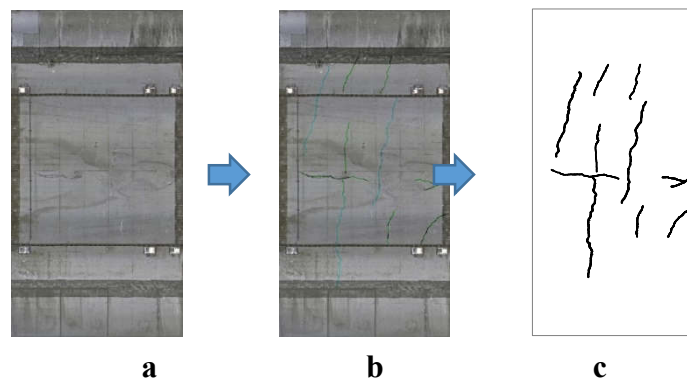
Extraction of cracks on tunnel lining surface: a, unfolded crack image; b, identification of cracks; c, extraction of cracks
